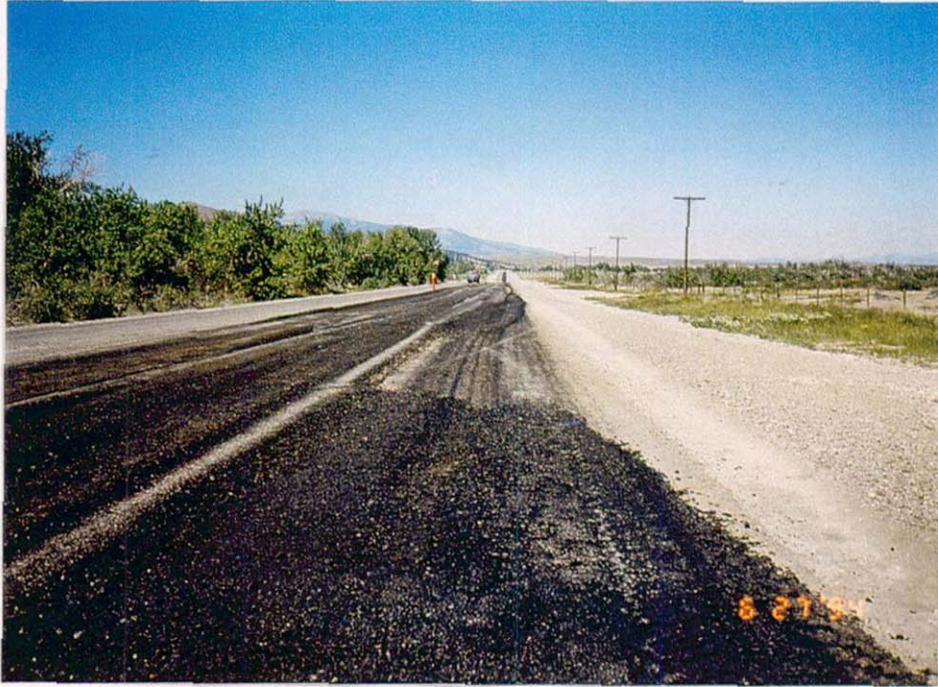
AC Mix Bladed into AB Potholes, Station 11+00 Northbound
